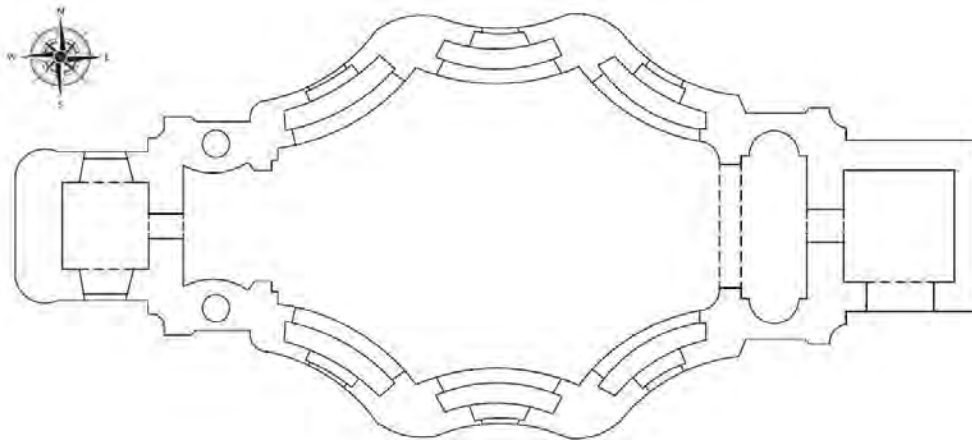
Floor plan of All Saints' Church in Hermankovice, Czech Republic.
